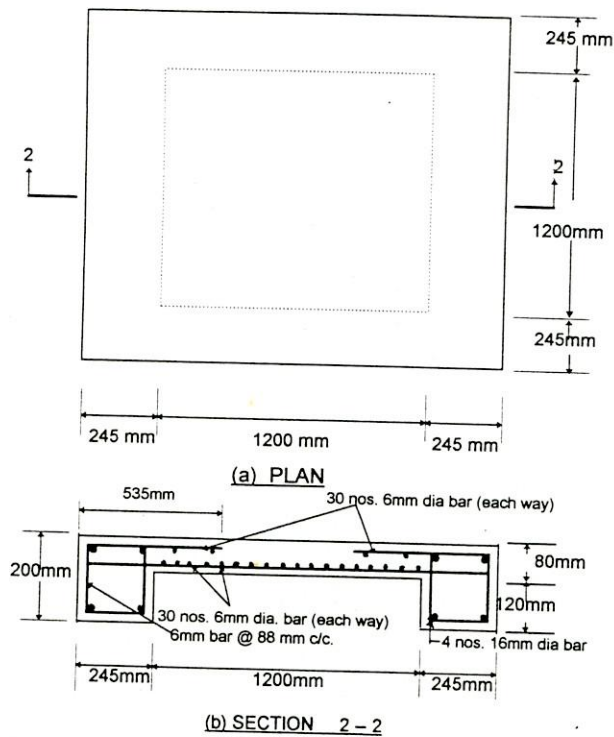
(a) Plan (b) Section and reinforcement details of SLAB2
